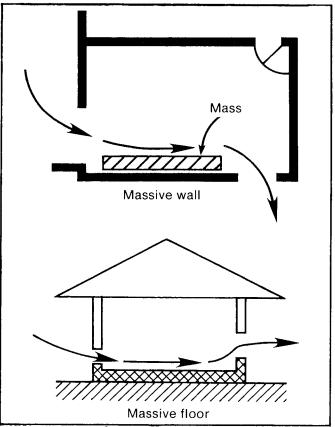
Window Locations to Create Wall Jets to Wash Massive Elements
